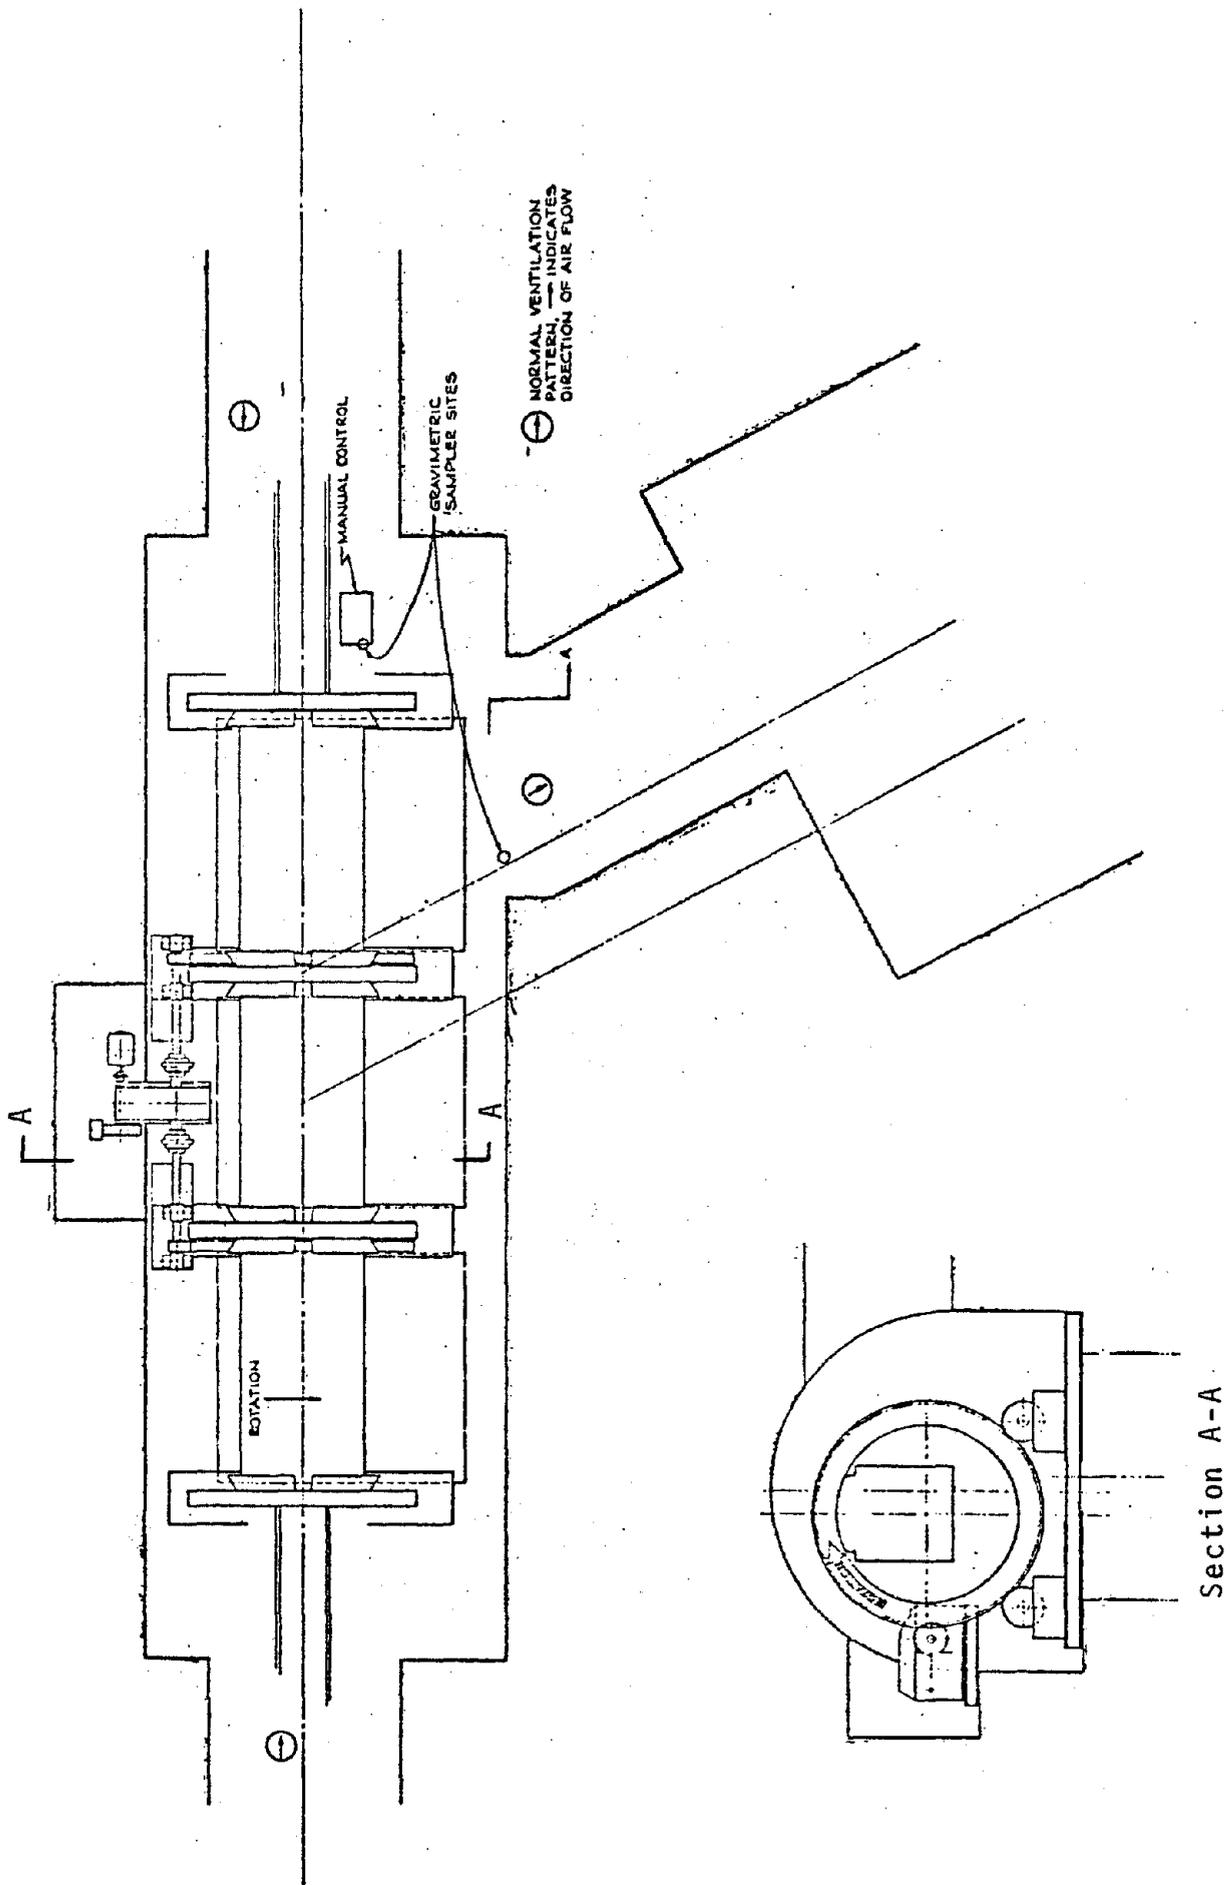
PLAN VIEW OF THE ROTARY DUMP
